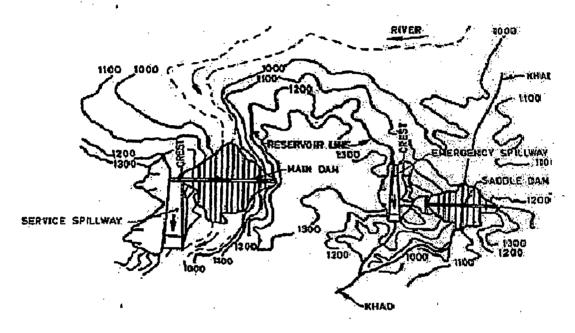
Layout plan of a service and auxiliary (emergency) chute spillway [4(\*\*)]
